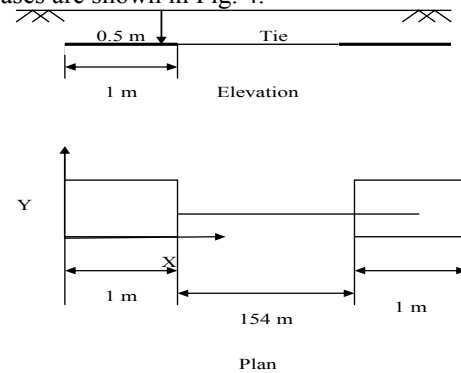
Plan and Elevation showing the intertied Square grids at Baddi (Not to scale)
